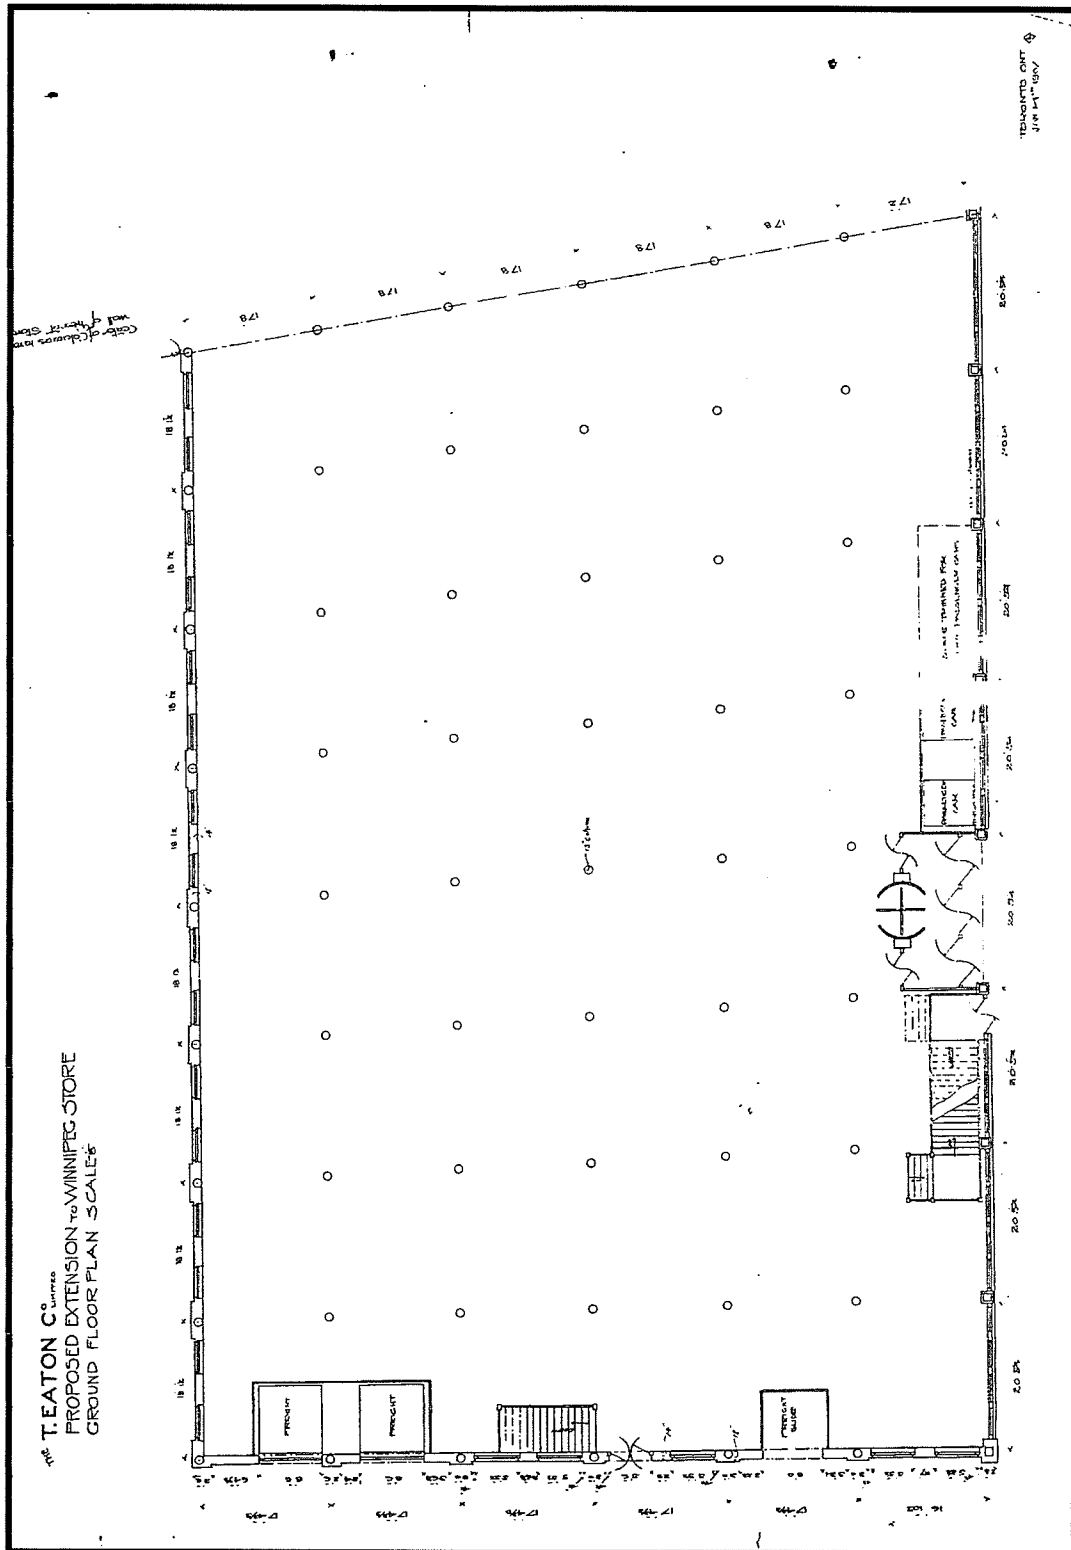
1907 Proposed Hargrave Extension –blueprint reduced from 1/16"=1' Ground Floor Plan – City of Winnipeg Archives.
